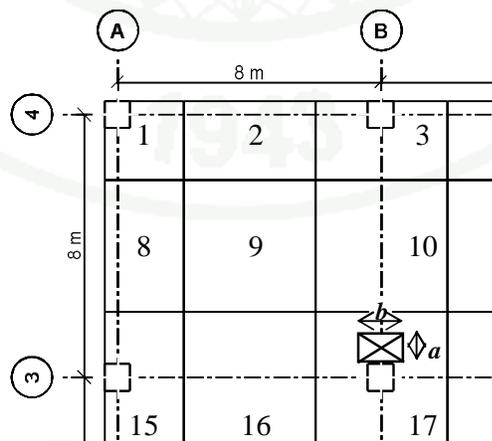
Flat plate model with opening at the exterior face of interior column [O-7]
